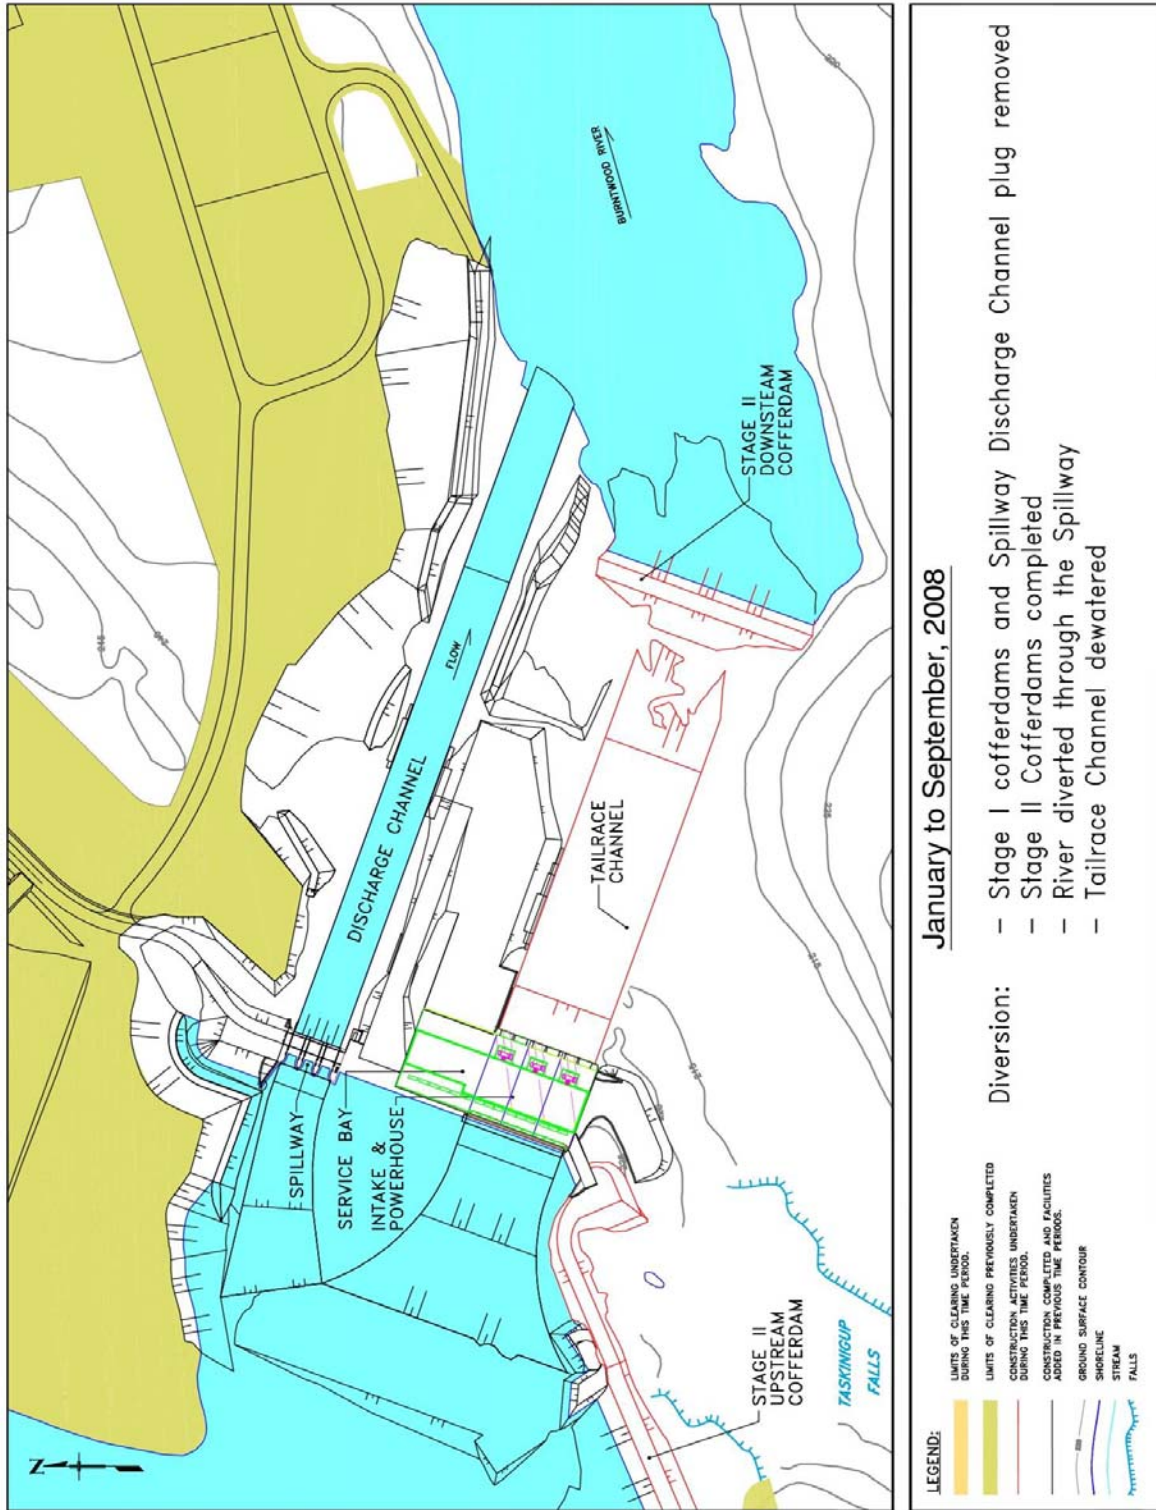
Proposed Construction Activities - January to September 2008
